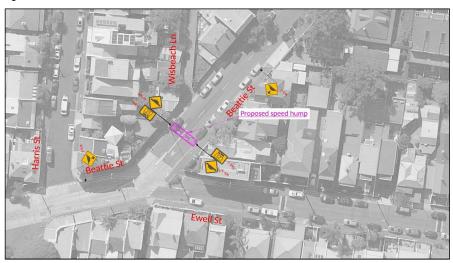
Beattie Street between Ewell Street and Wisbeach Lane proposal.
